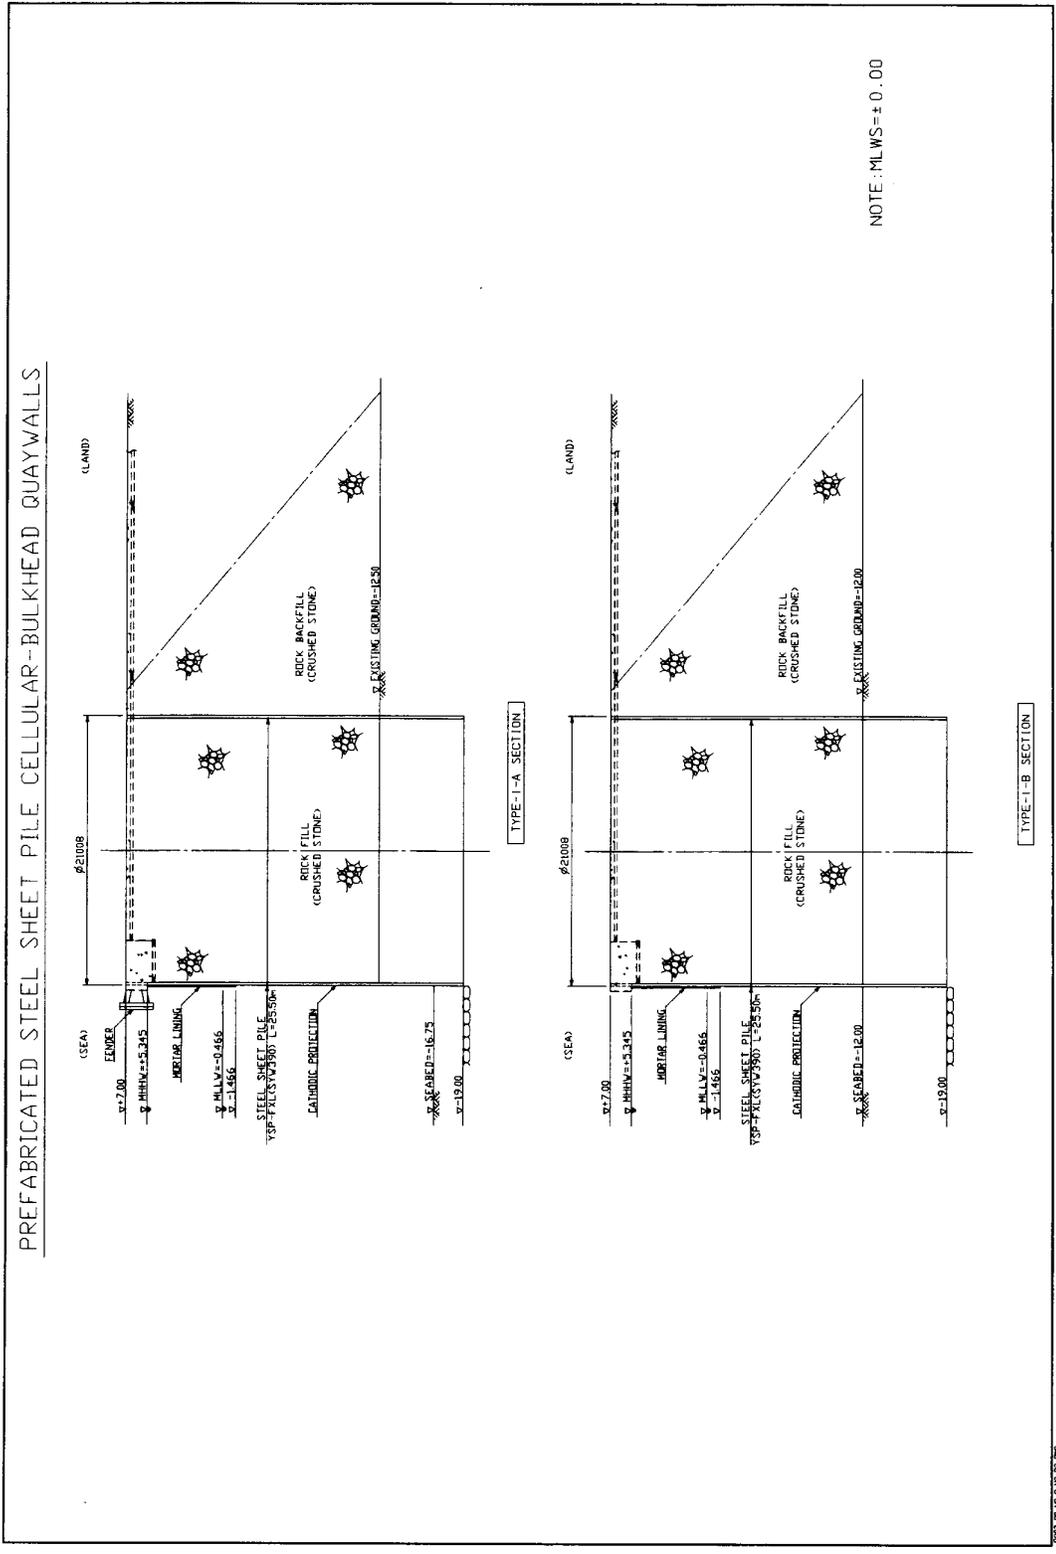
Section of Steel Sheet Pile Cellular-bulkhead Quaywall (TYPE-1-A, 1-B)
